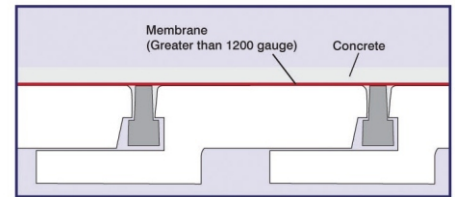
Floor construction using F/T Flat Top panel with rigid membrane barrier
